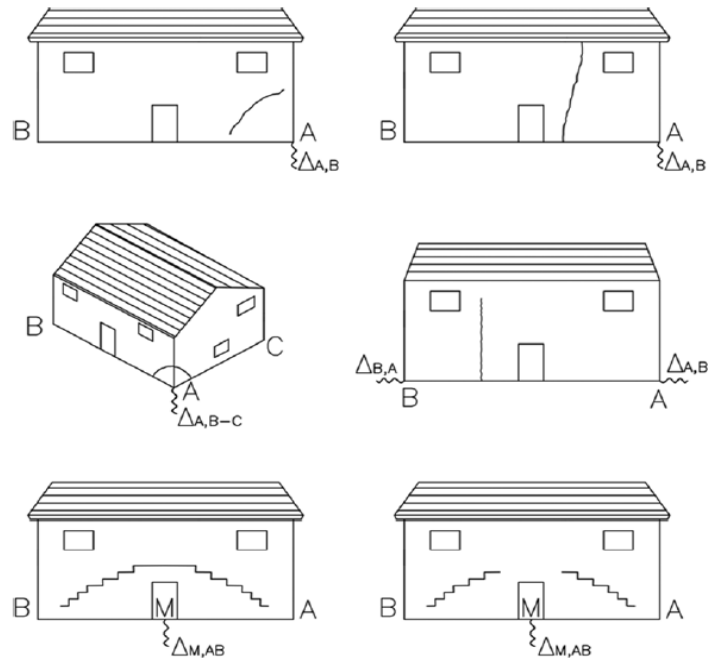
Building damage linked to different type of foundation settlements (from Plamisano et al, 2016).
